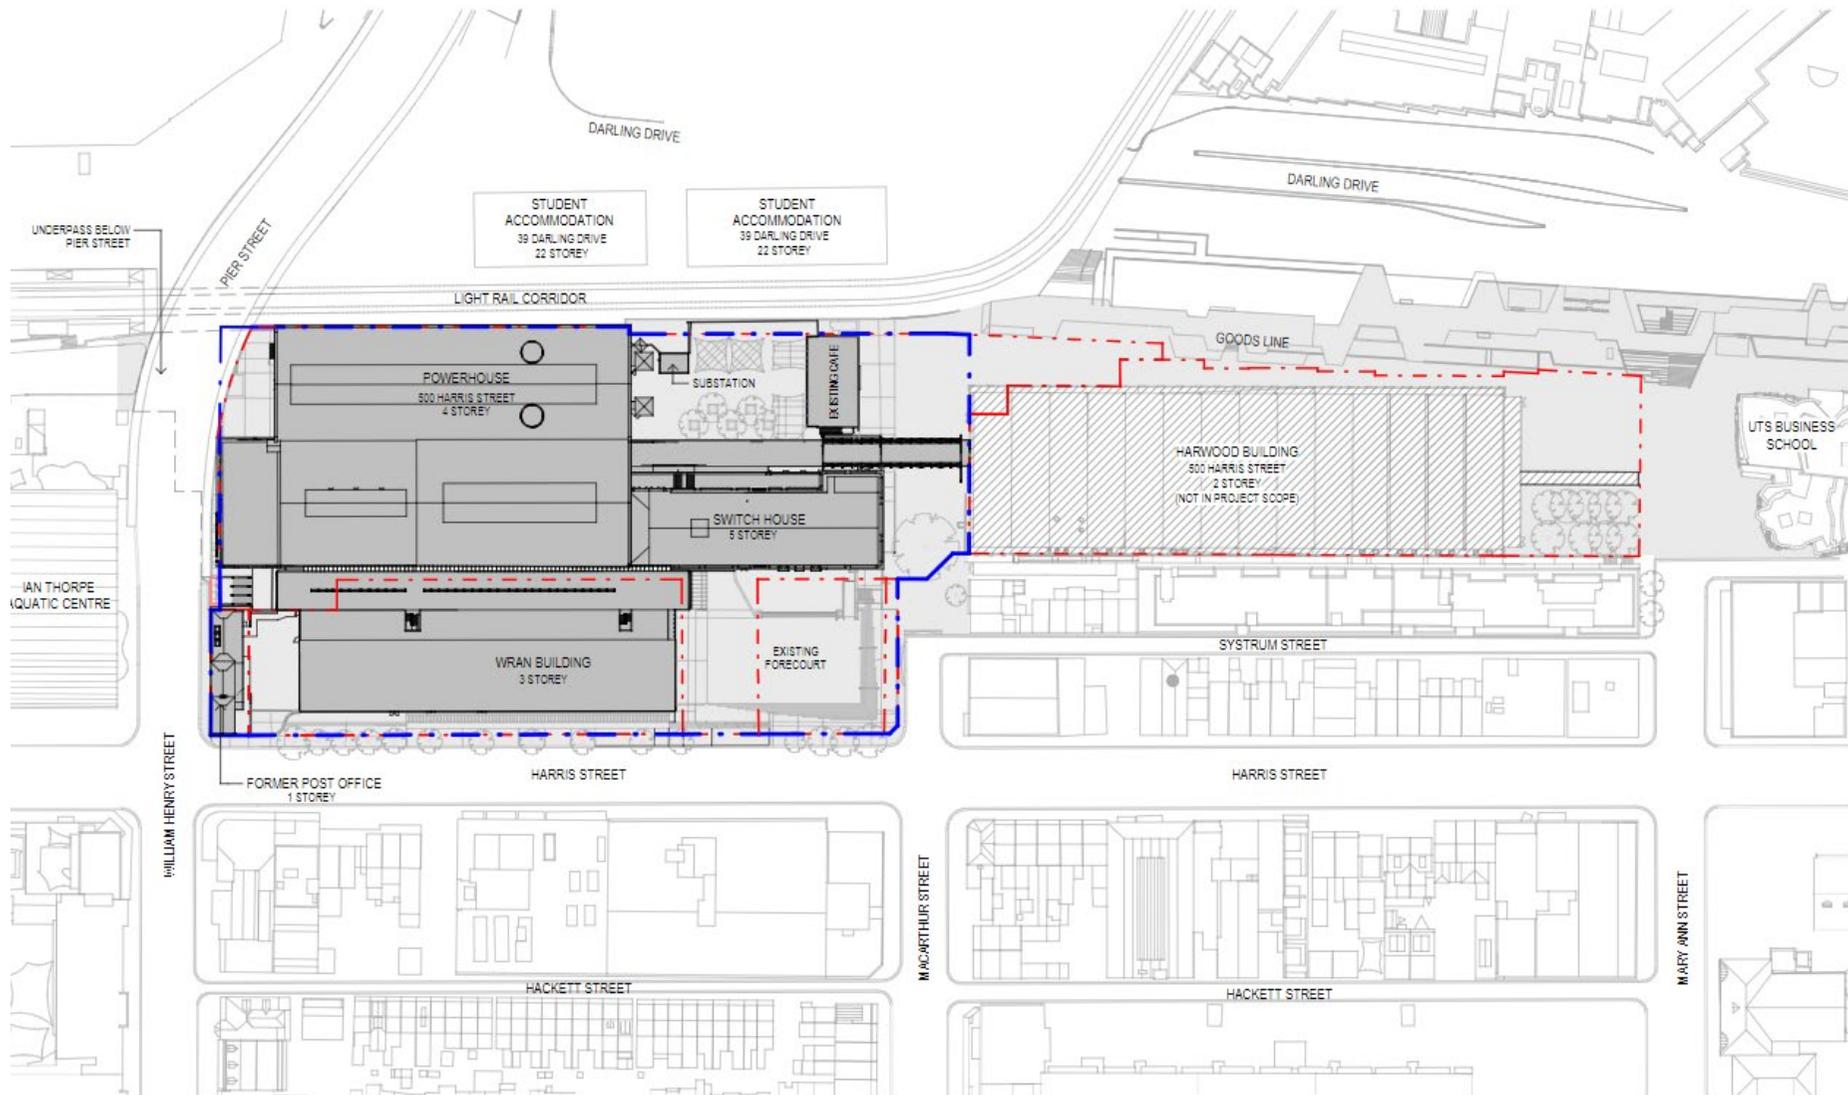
Ultimo Powerhouse- Building Envelope Existing Site Plan (Source: John Wardle Architects 2022)
